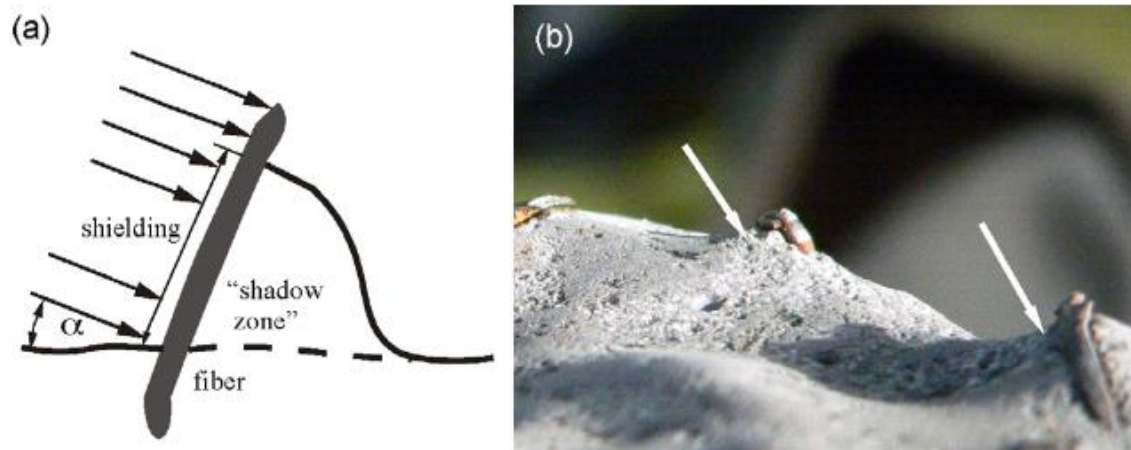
Formed shadow zone in steel fiber reinforced concrete (Horszczaruk 2009):
